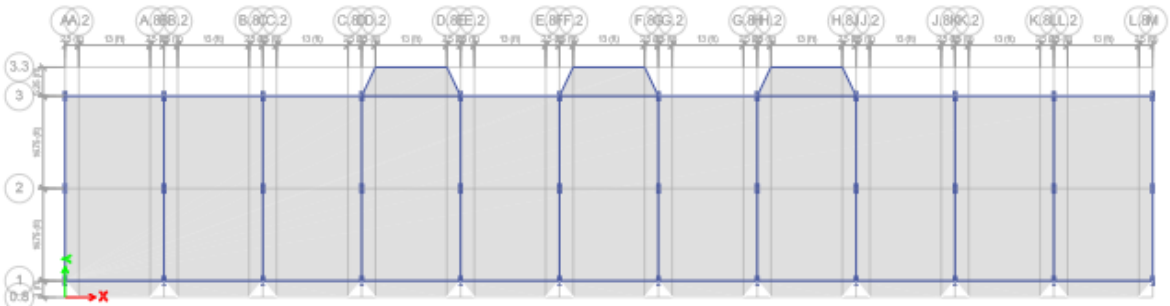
2: Typical Plan View of the ETABS Model of Existing Building
